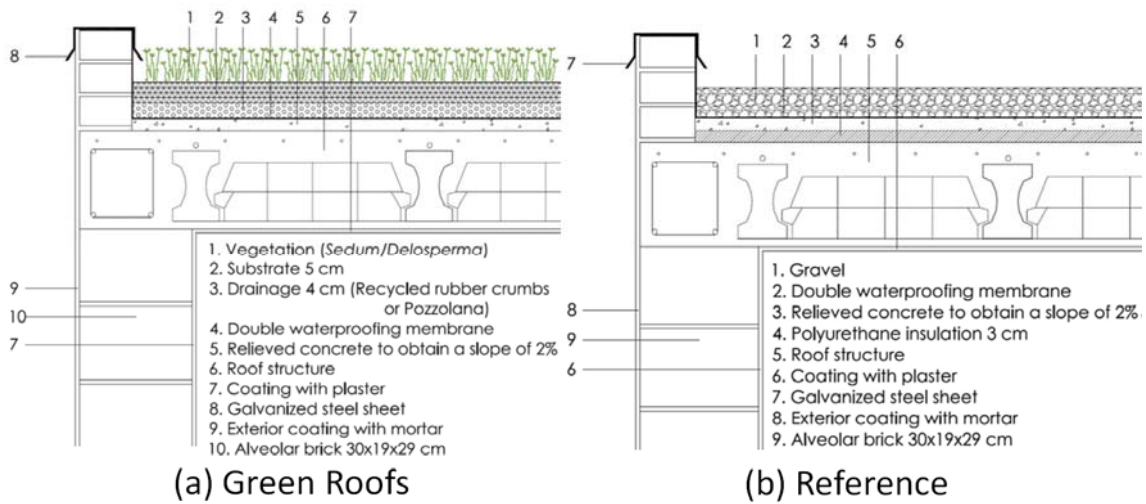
Detailed construction section of green roofs (a) and reference (b) roof cubicles [28]
